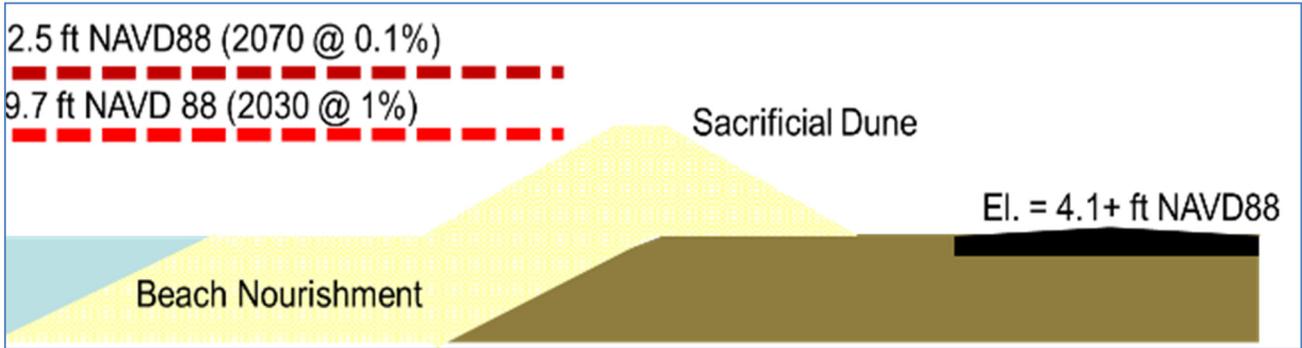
Seaview Avenue at Farm Pond – Option C - Dune Protection
